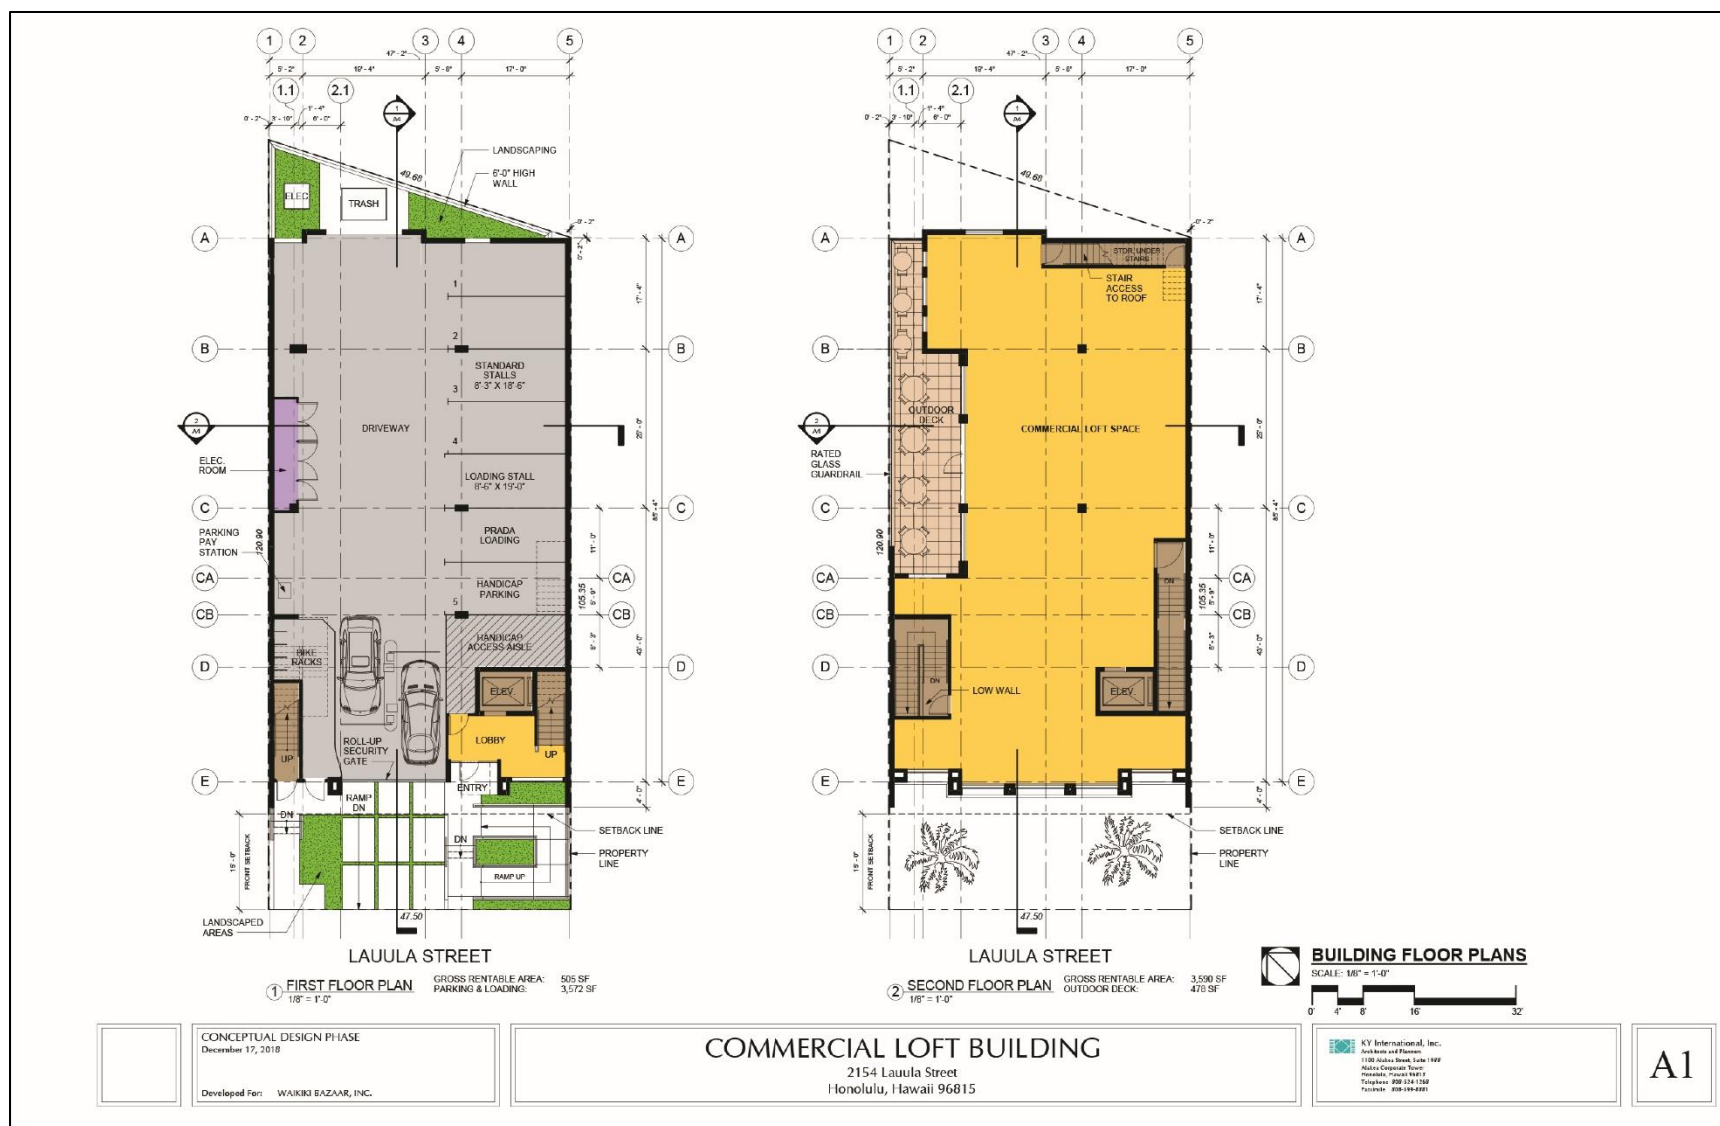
Conceptual Plan Showing the Proposed Commercial Loft Building Floor Plan (provided by client)
